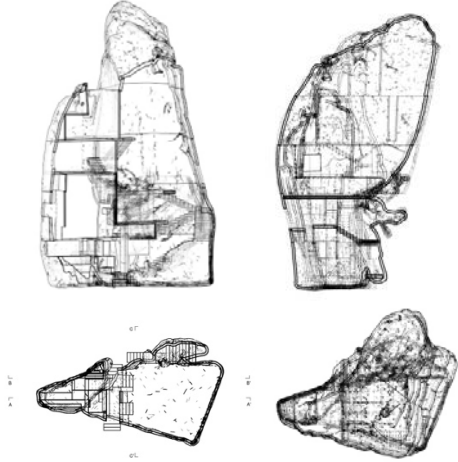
Section drawing and plans (first floor and roof), Troglodyte, Villa Tekhnai, 2021-23.
